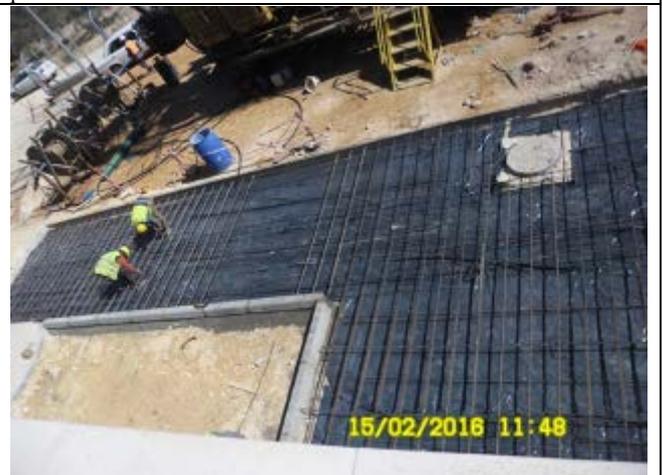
h of February, 2016: Start and finish formwork and steel reinforcement for concrete pavement Area #5.
